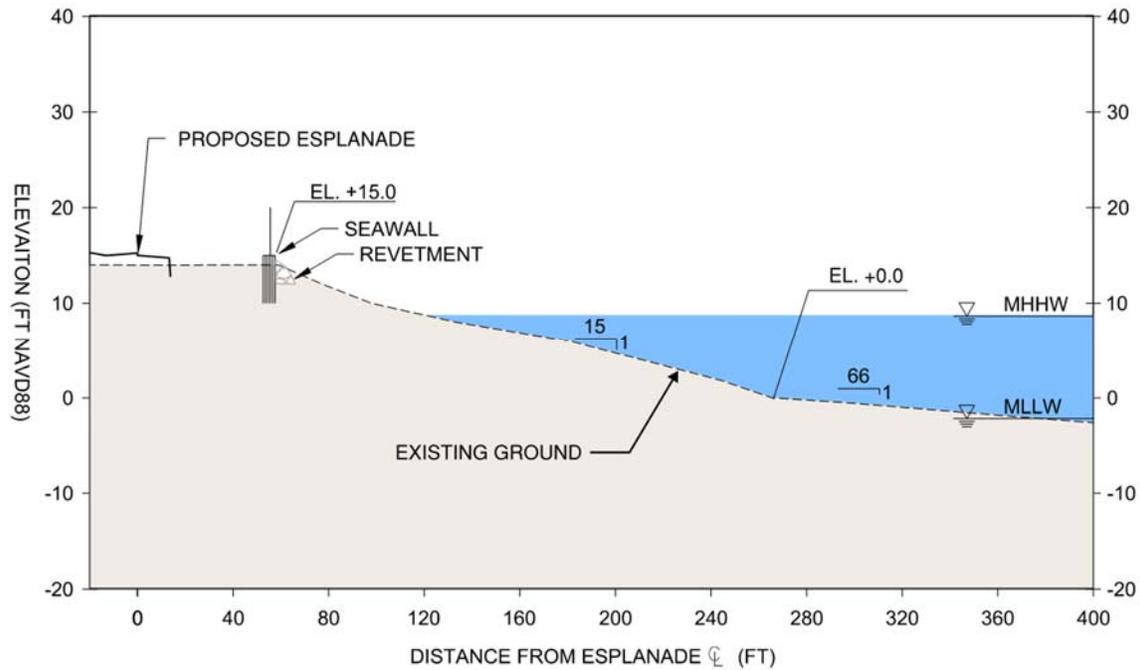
Elevation profile for a typical section of Reach 3. Elevations are referenced to NAVD88 in feet. Location and details of seawall and revetment are approximate.
